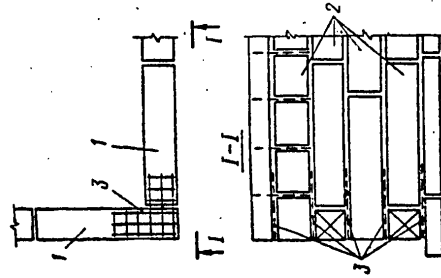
Reinforcement of corner joints of precast concrete block walls
